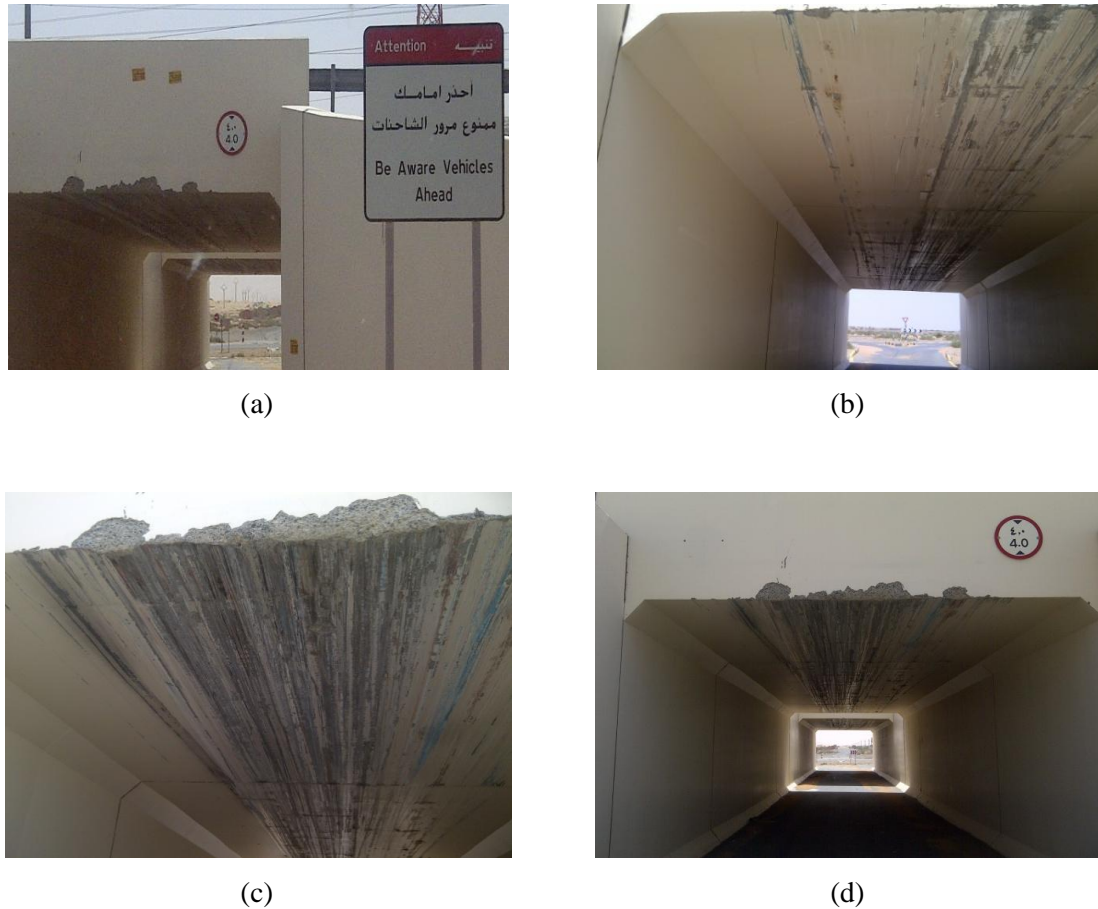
Overpass on the Bypass Road, Sharjah, UAE (photos taken by author)
